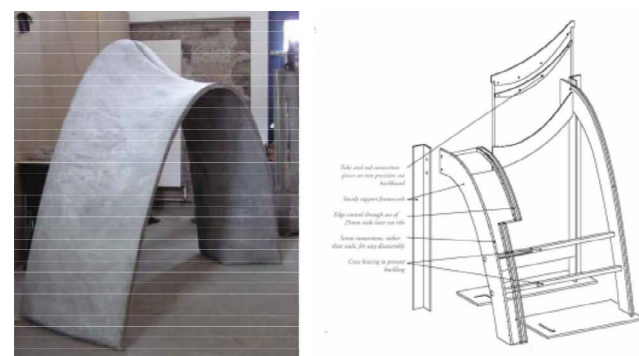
Rigid frame setup to cast a concrete gaussian vault and the hardened element (Pedreschi, 2011)
